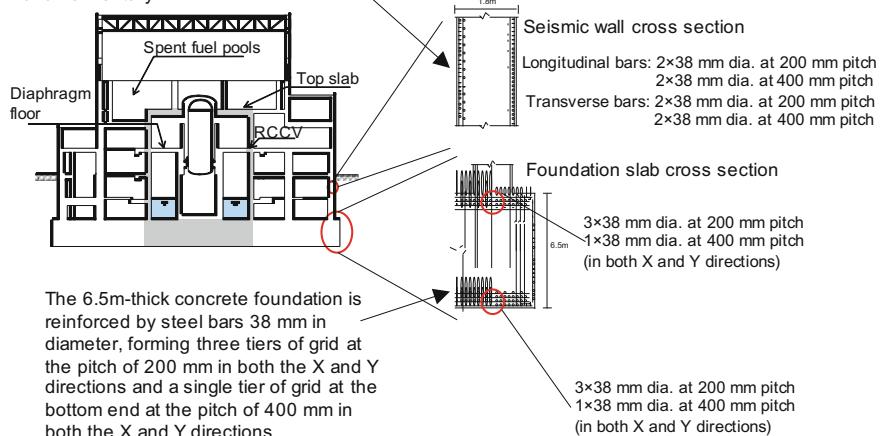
Design of reinforced-concrete components of a reactor building
